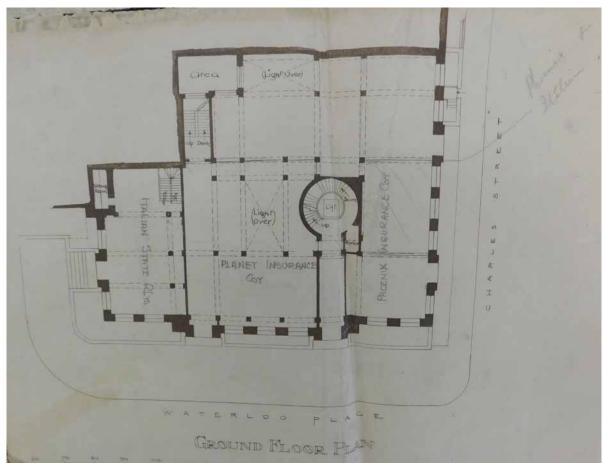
1912 Ground floor plan of 12 Waterloo Place, WPA
